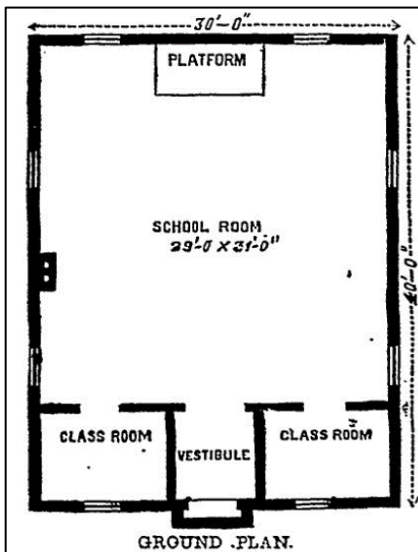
Prospective one-room schoolhouse floorplan (*The Canada Farmer*, Vol. 3, no. 12, p.189)
